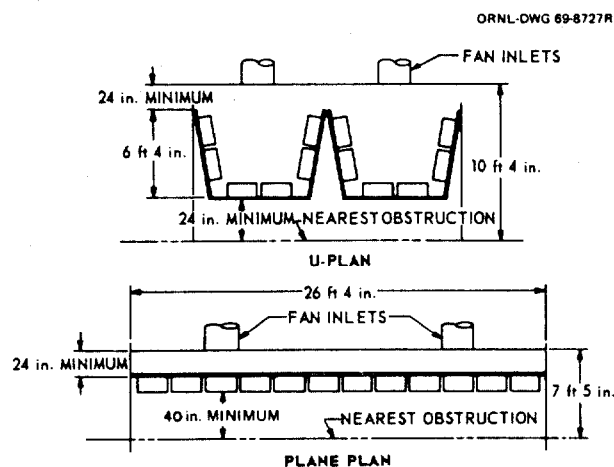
Filter bank floor plans showing minimum clearances and floor space required.
